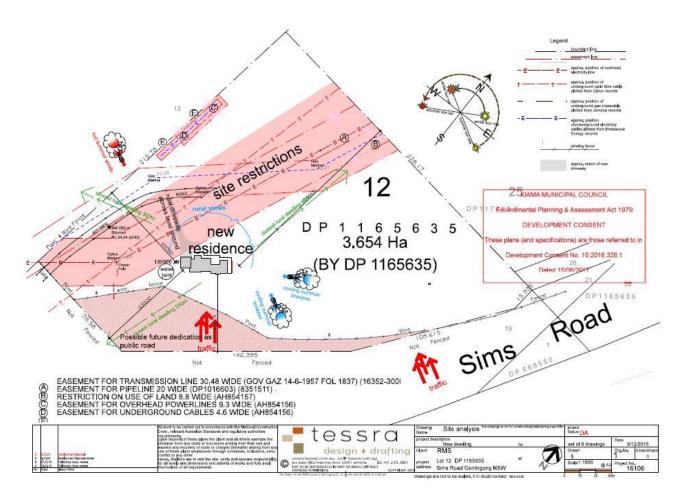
Easement restrictions on Lot 40, 5 Sims Road Gerringong (source: Approved development plan for dwelling house DA 10.2016.328.1)
